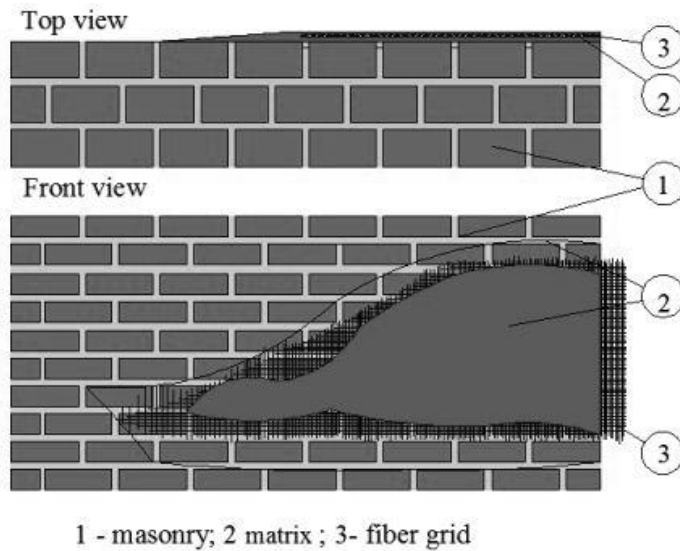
Textile reinforced mortar applied to an URM wall [19]
